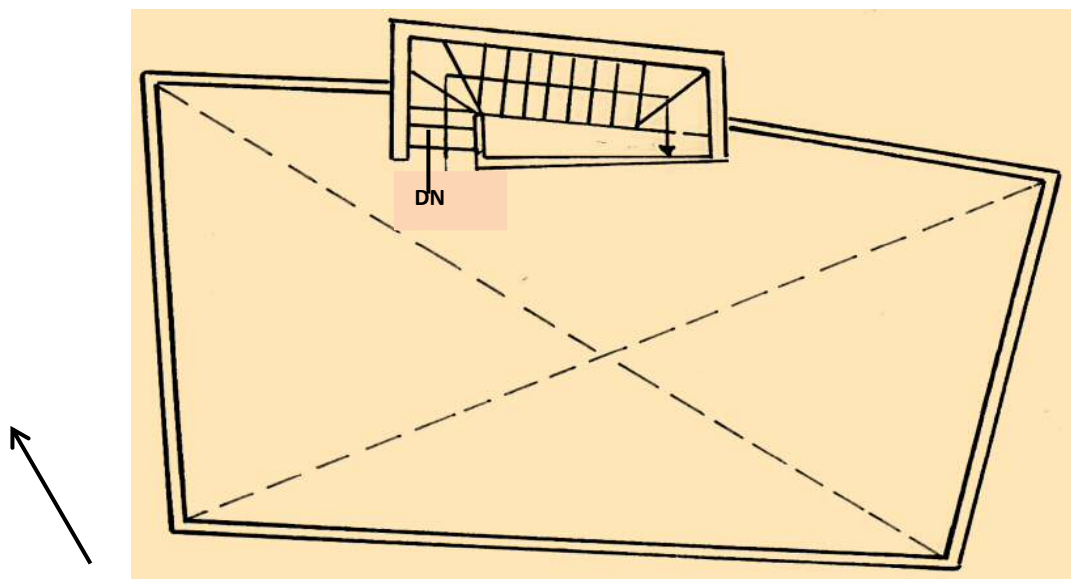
Roof terrace level plan of modern house No. 5. Scale: 1:100
